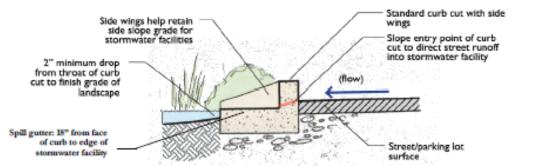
Standard curb cut with side wings: cut section view (Source: SMCWPPP 2009)
